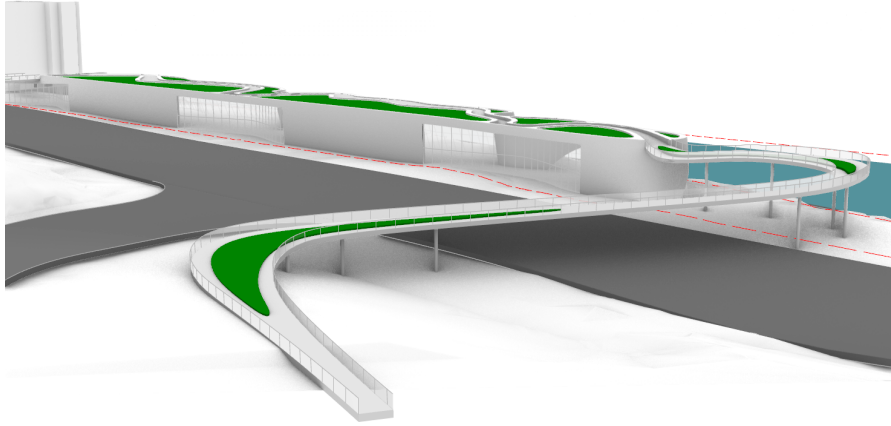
Pedestrian bridge from N. Broadway green plaza. Building glass sections.
